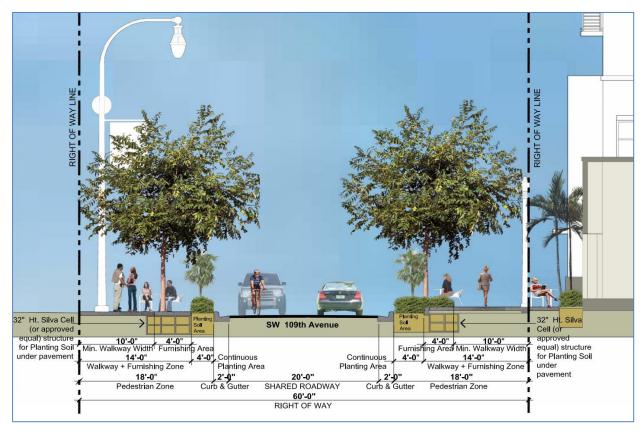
Proposed Complete Street Improvements along SW 109th Avenue
